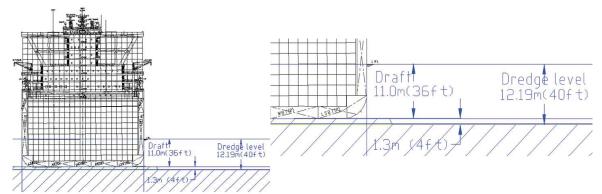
Front and midship draft and initial dredging depth (section view left, detailed section view right)
